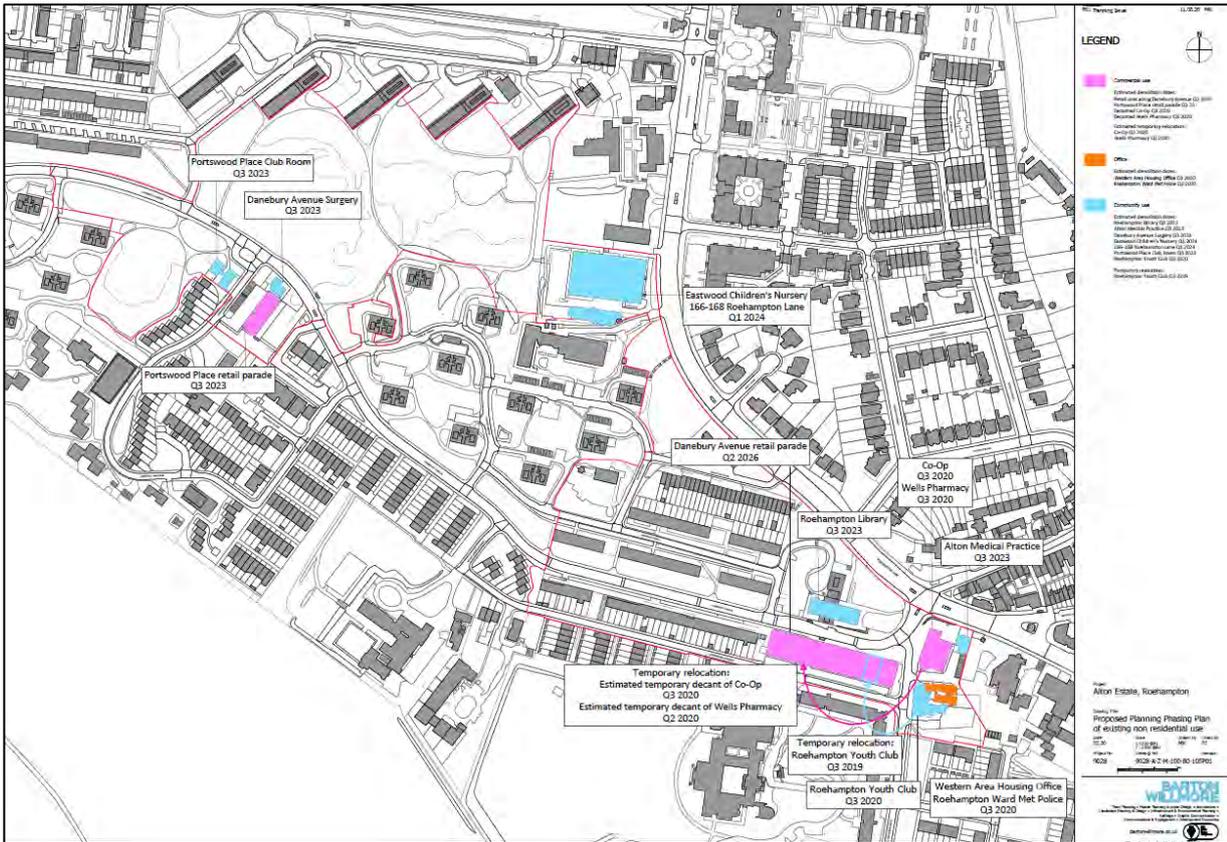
EXISTING NON-RESIDENTIAL USES PHASING PLAN
